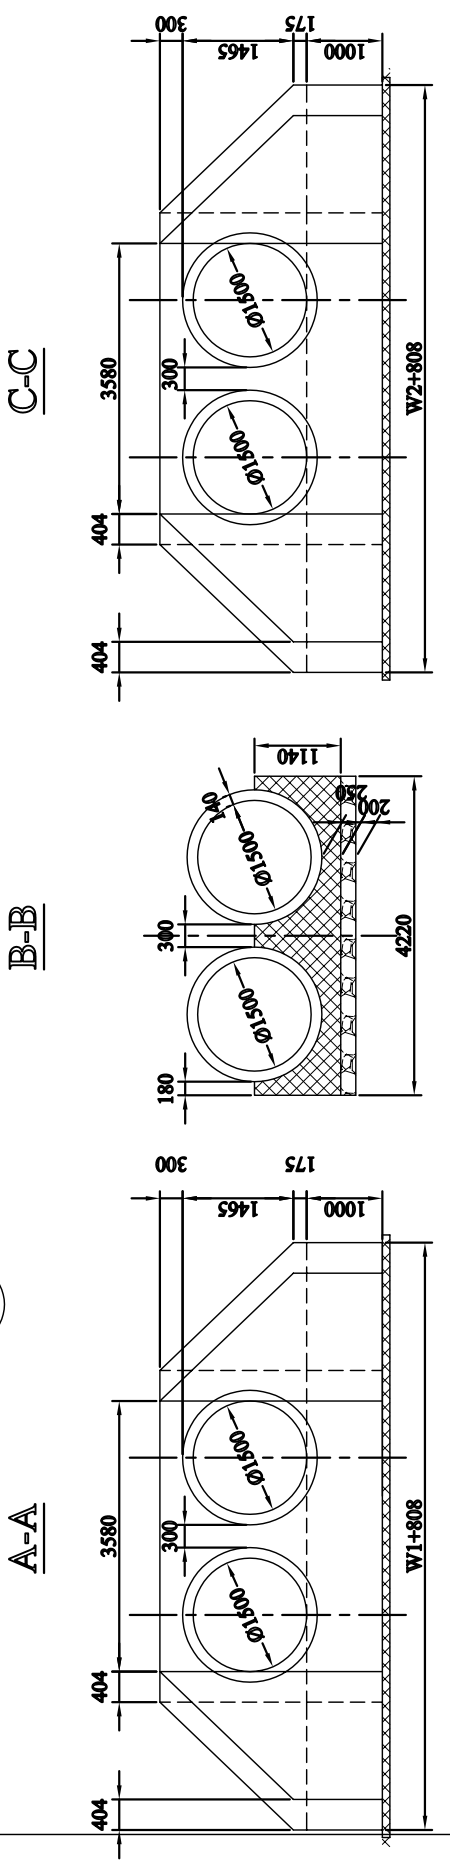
General View of Pipe Culvert(Type "C" 2@ø=1500)
